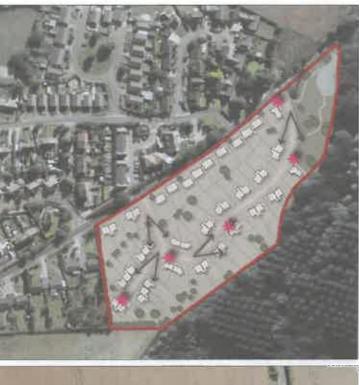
Diagram showing proposed gateways and landmark houses placed at the focal points within Development Site 2
